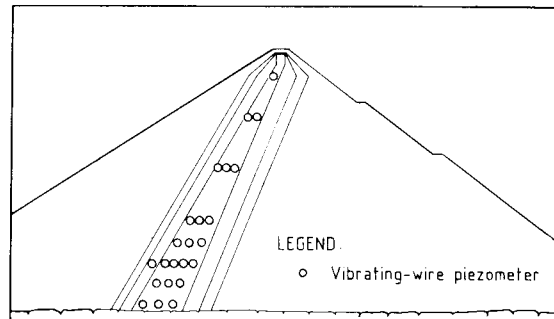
Central cross section Svartevann Dam. Locations of pore pressure piezometers.
